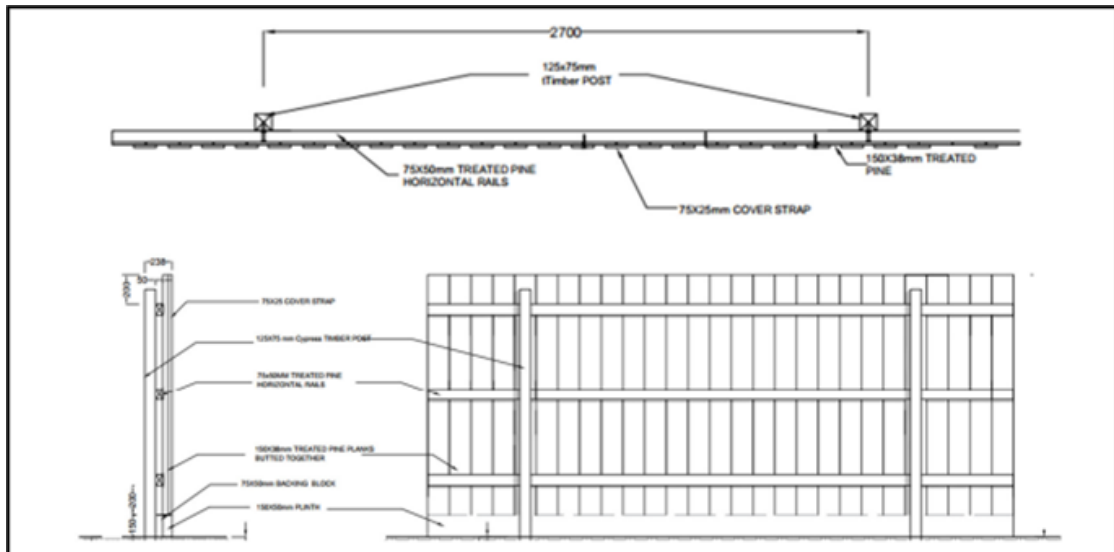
Acoustic barriers around the ground floor play areas (Source – Development Plans)
